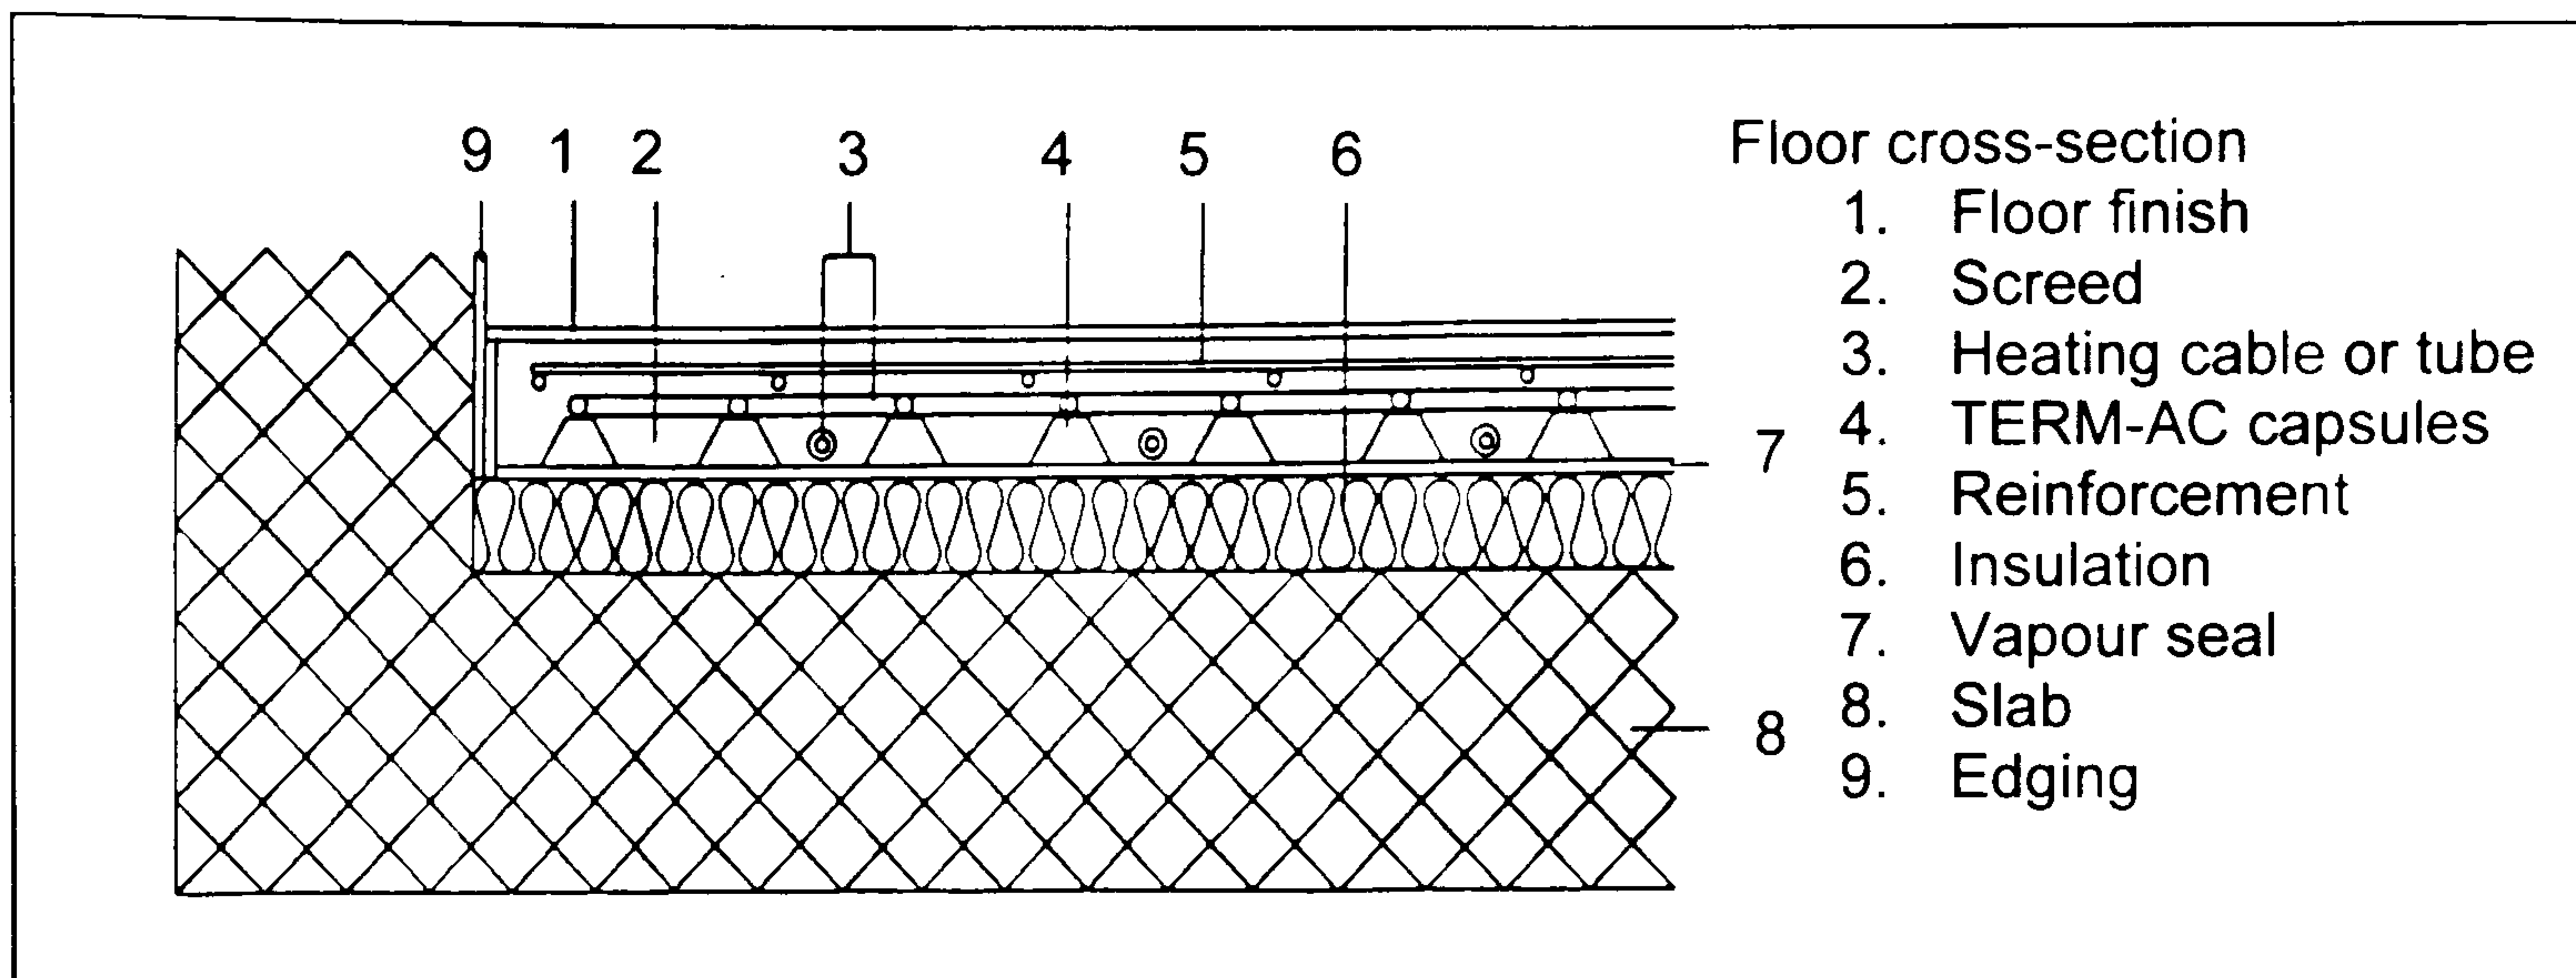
Cross-section through PCM floor heating system (Austen, 1990)
